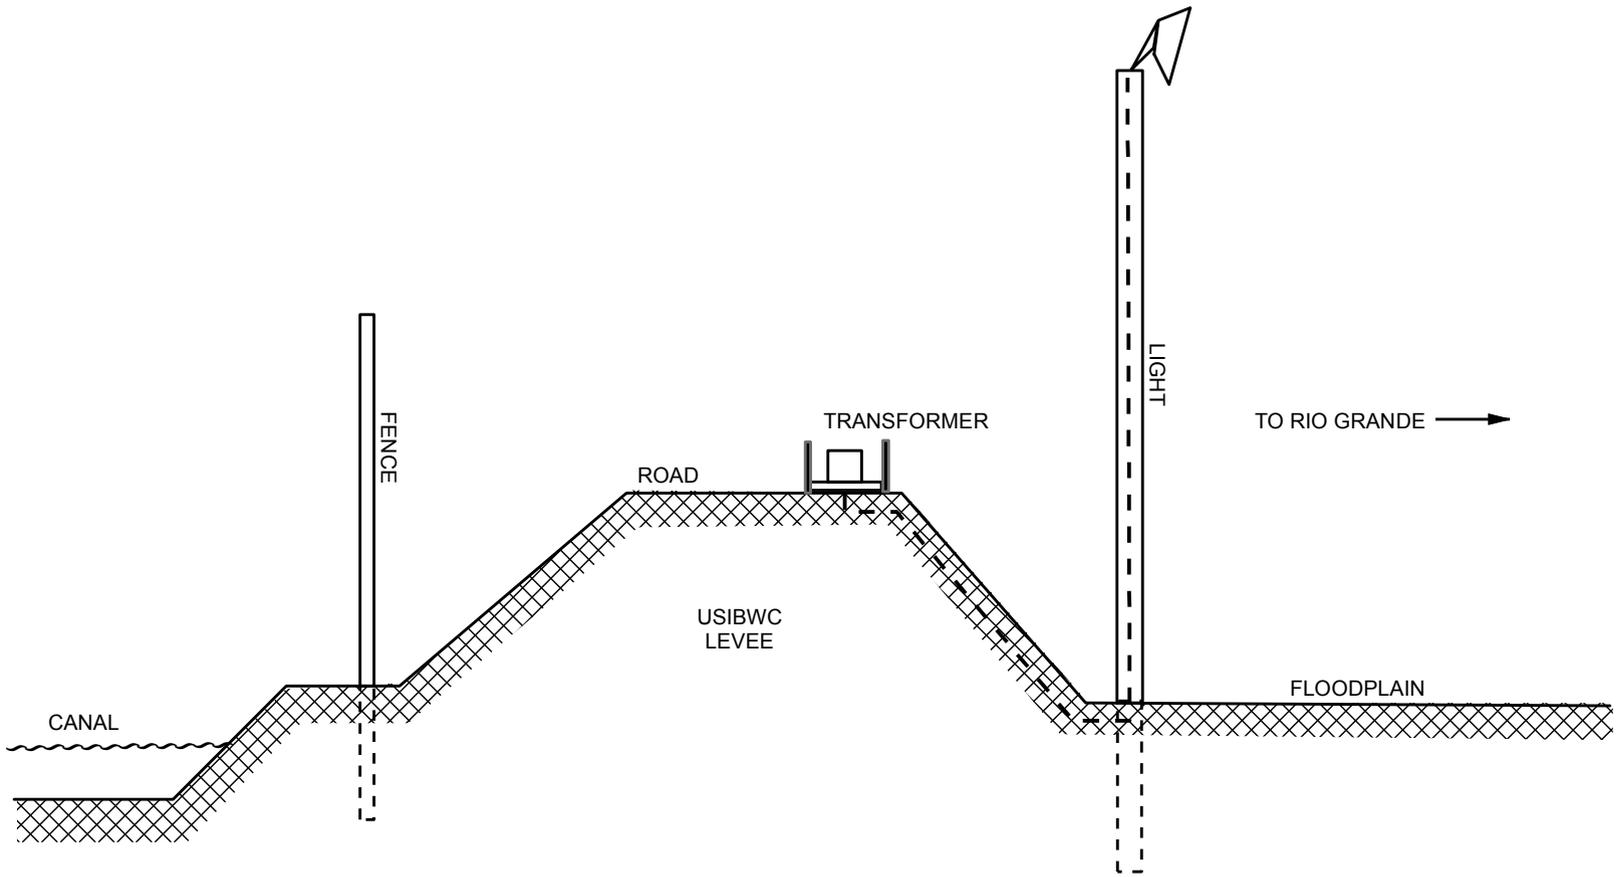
Typical Schmatic Cross Section, Proposed Action
